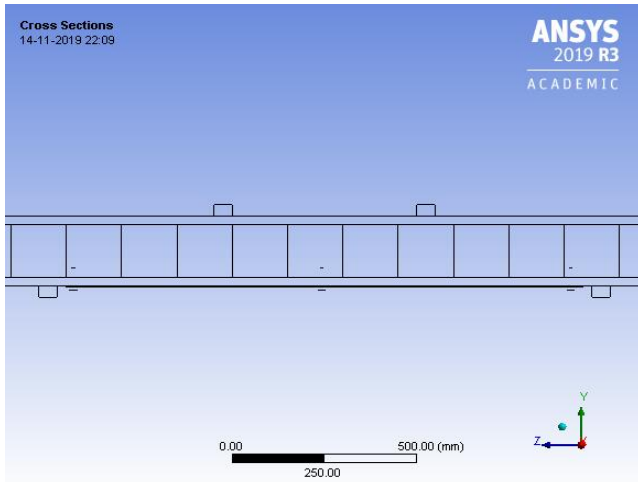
Reinforcement with the plate bolted in soffit of the beam
